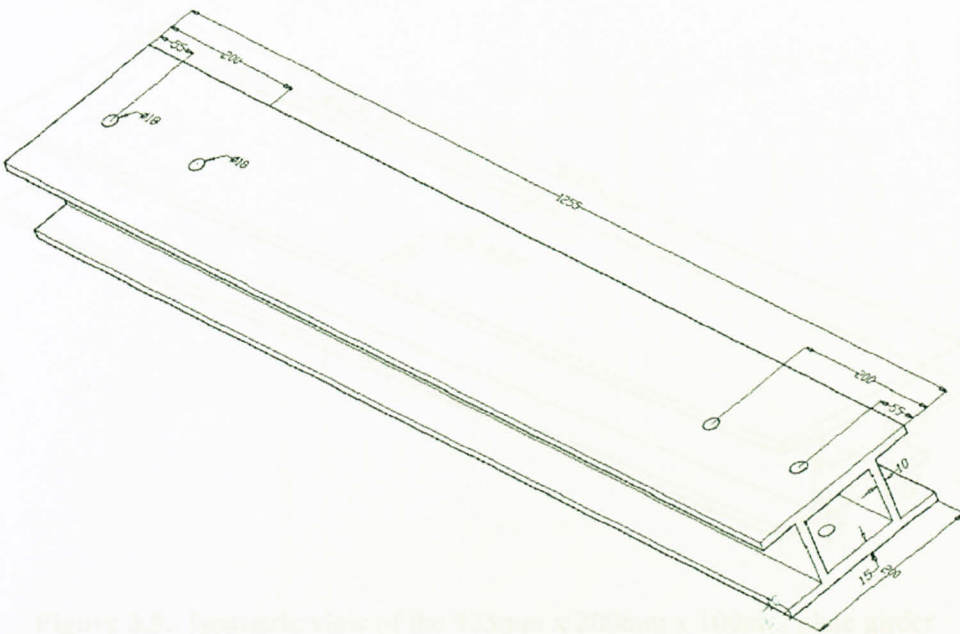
Isometric view of the 1255mm x 200mm x 100mm plate girder
